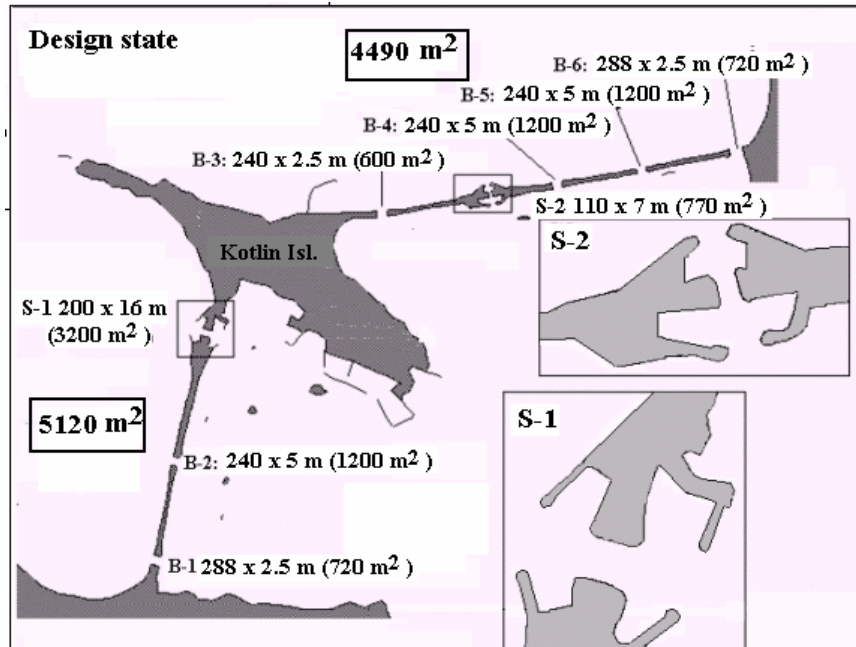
Design of the St. Petersburg Flood Protection Barrier
